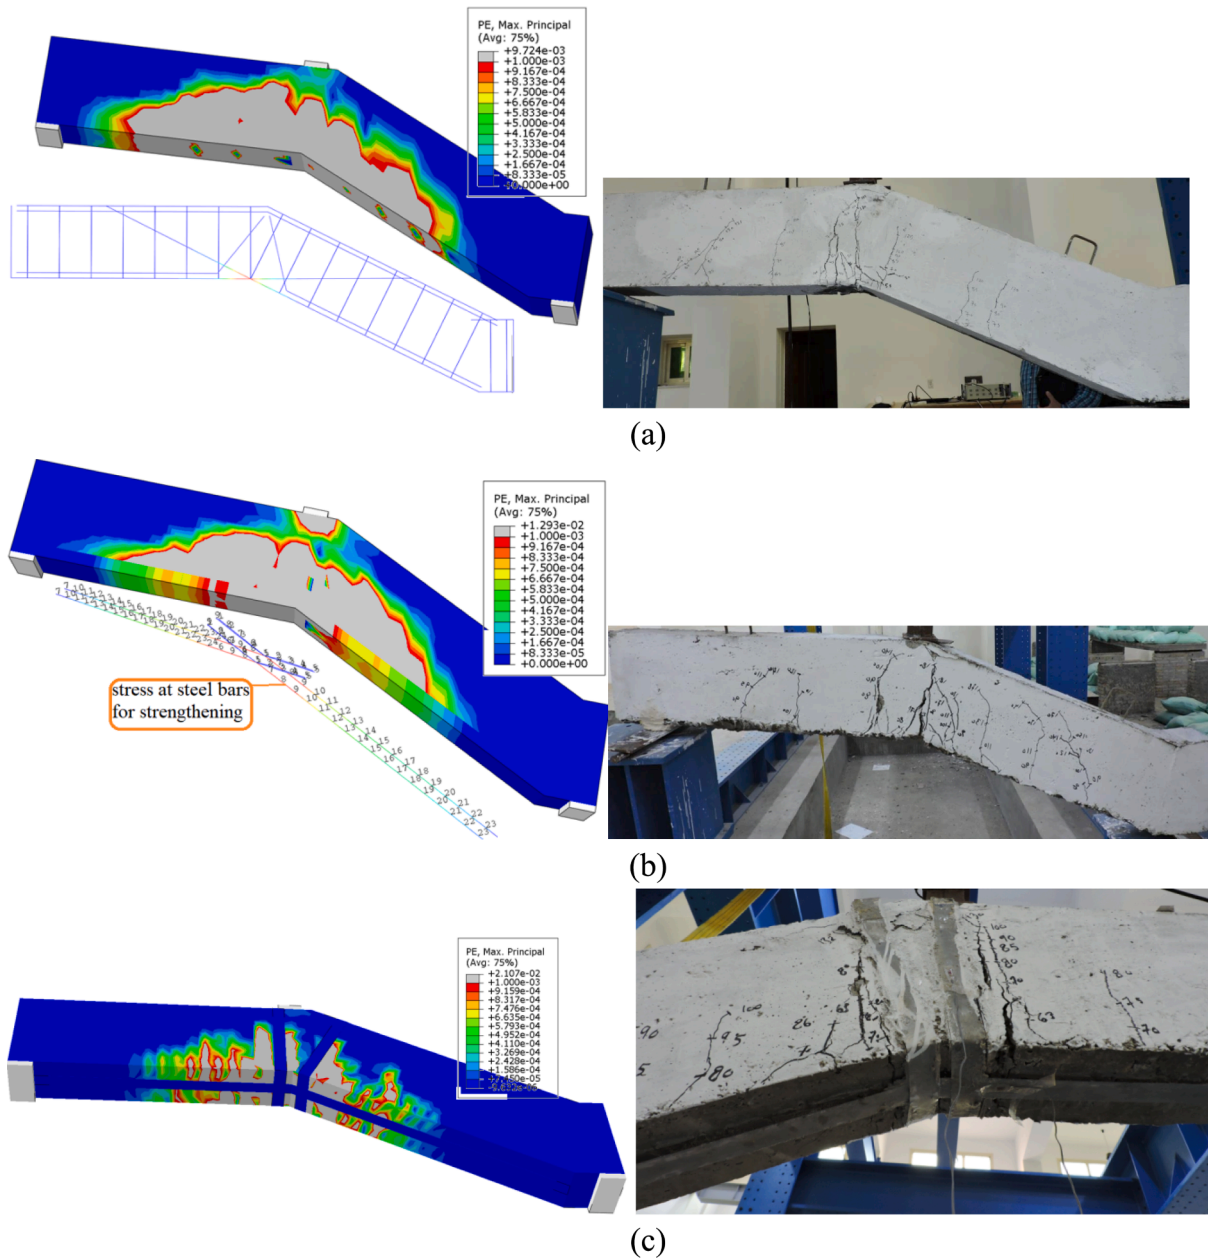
Final cracks of tested beams obtained from FE analysis: (a) Master beam B0; (b) B1 and B2; (c) B4.
